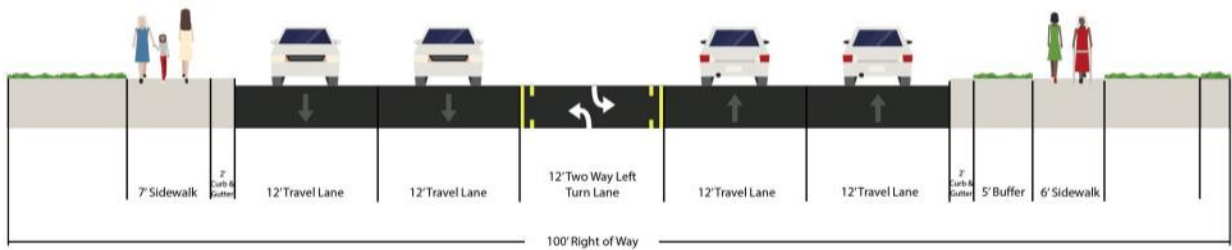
Existing Typical Section - North of US 98 (SR 30)
